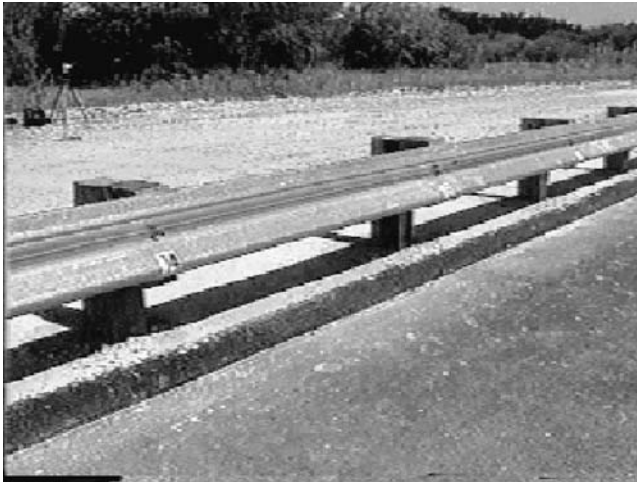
Guardrail-curb installation for TTI test 404201-1.
